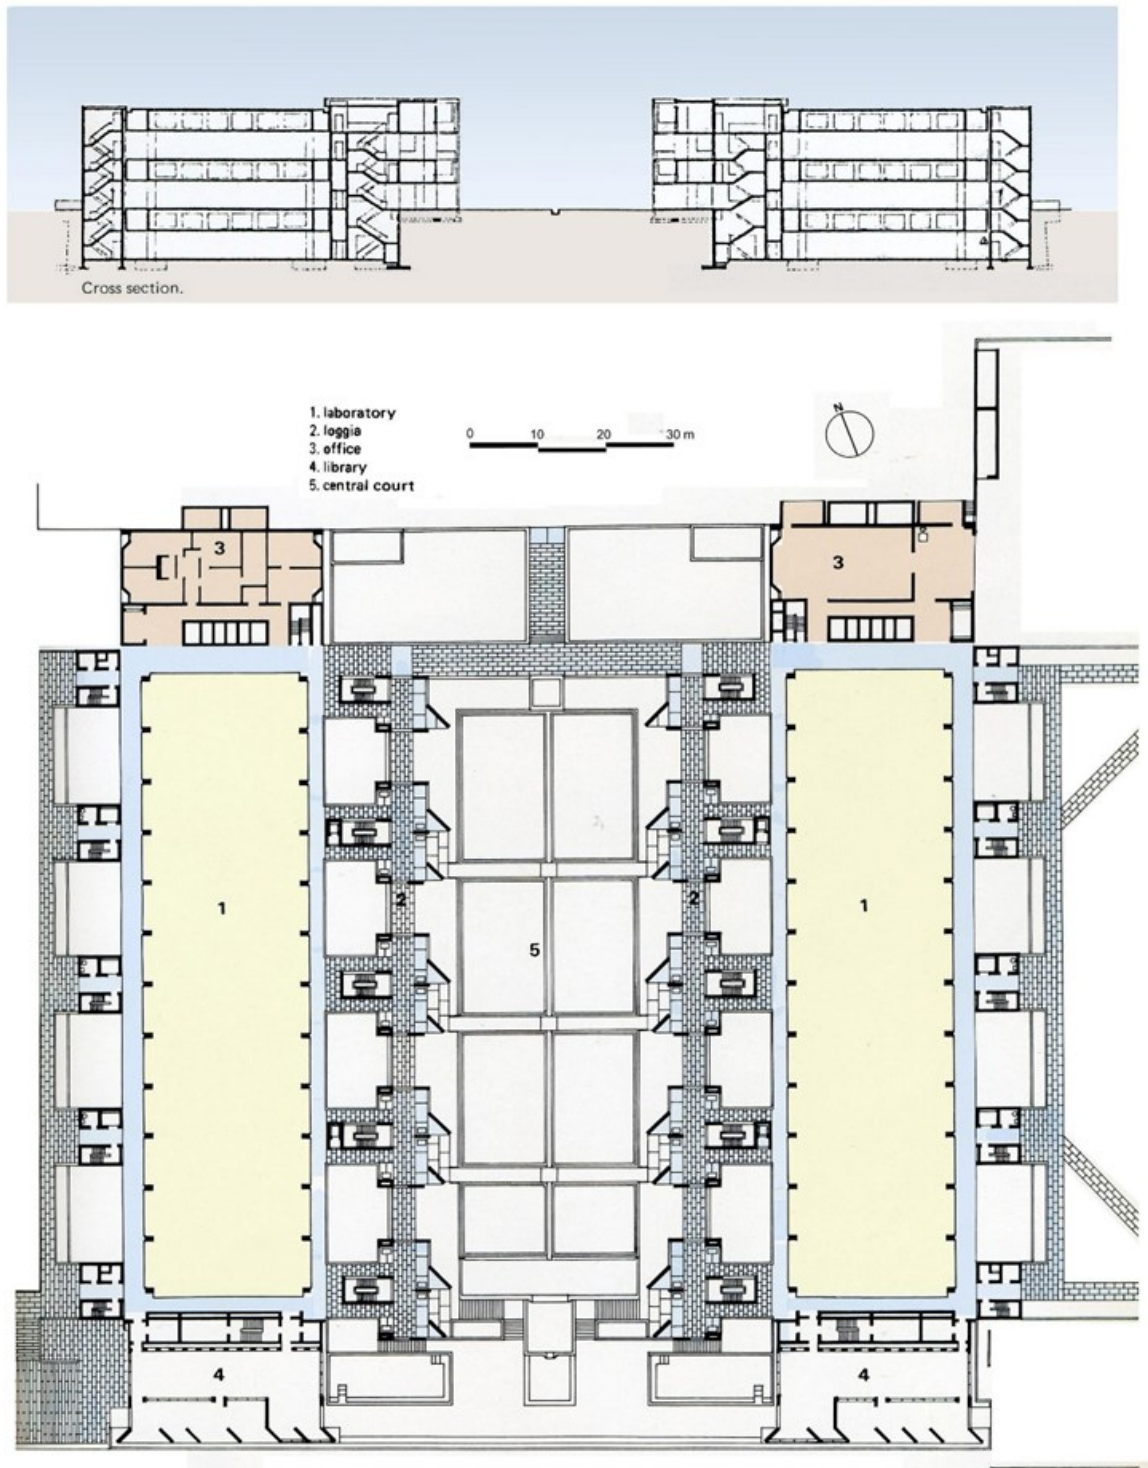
The two rectangular laboratory blocks of the Salk Institute submerged into the site by a storey and separated by a concrete plaza overlooking the ocean.
